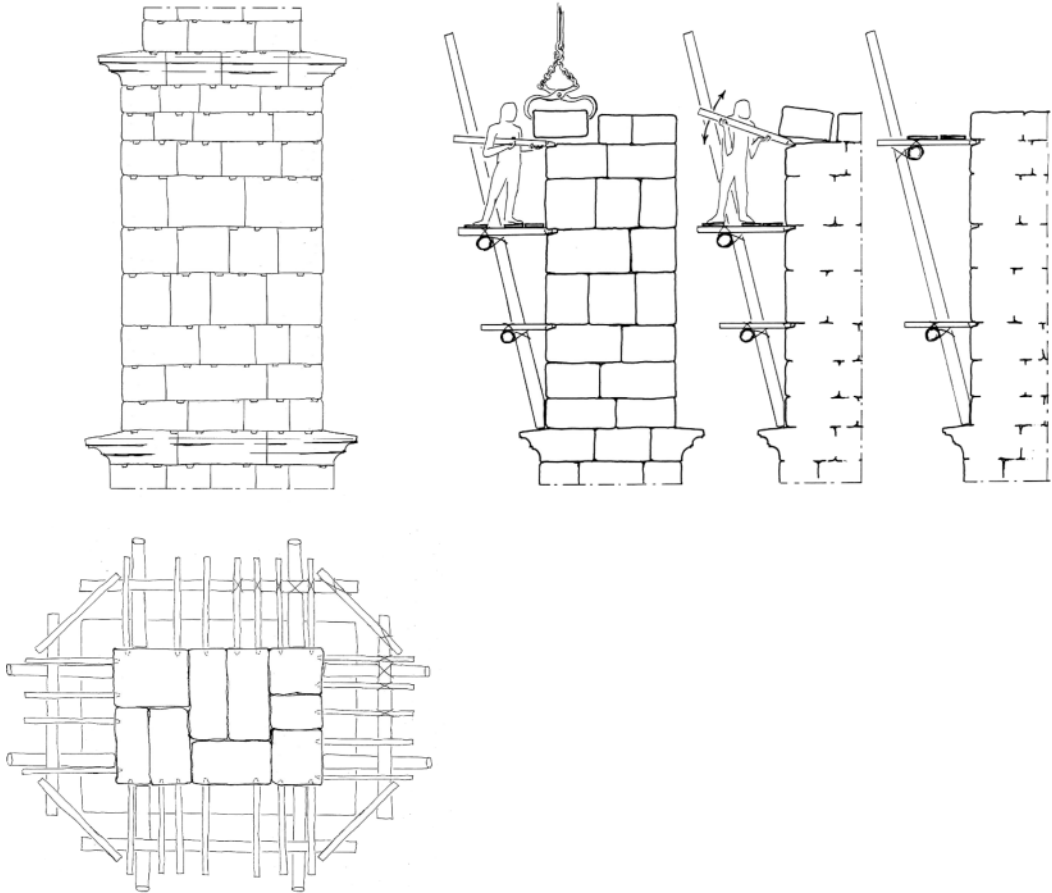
Reconstruction of scaffolding type for Segovia Aqueduct piers (Drawings Jos Tomlow).
